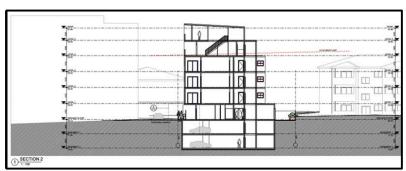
Figure B: Section 2 of the proposed building showing the 12.5m height limit as red dotted line
